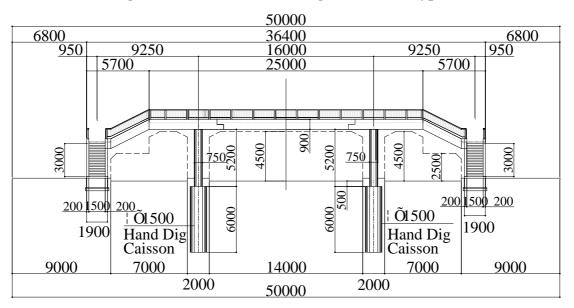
Pedestrian Bridge Structure (Typical)
